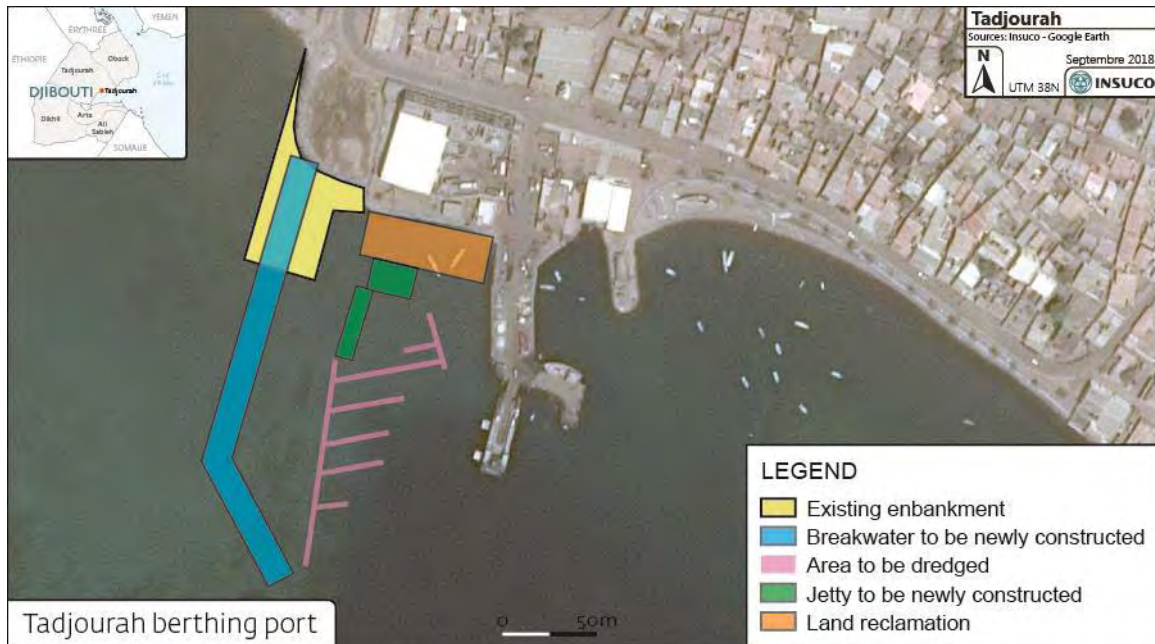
Existing and new infrastructures to be built in the port of Tadjourah
